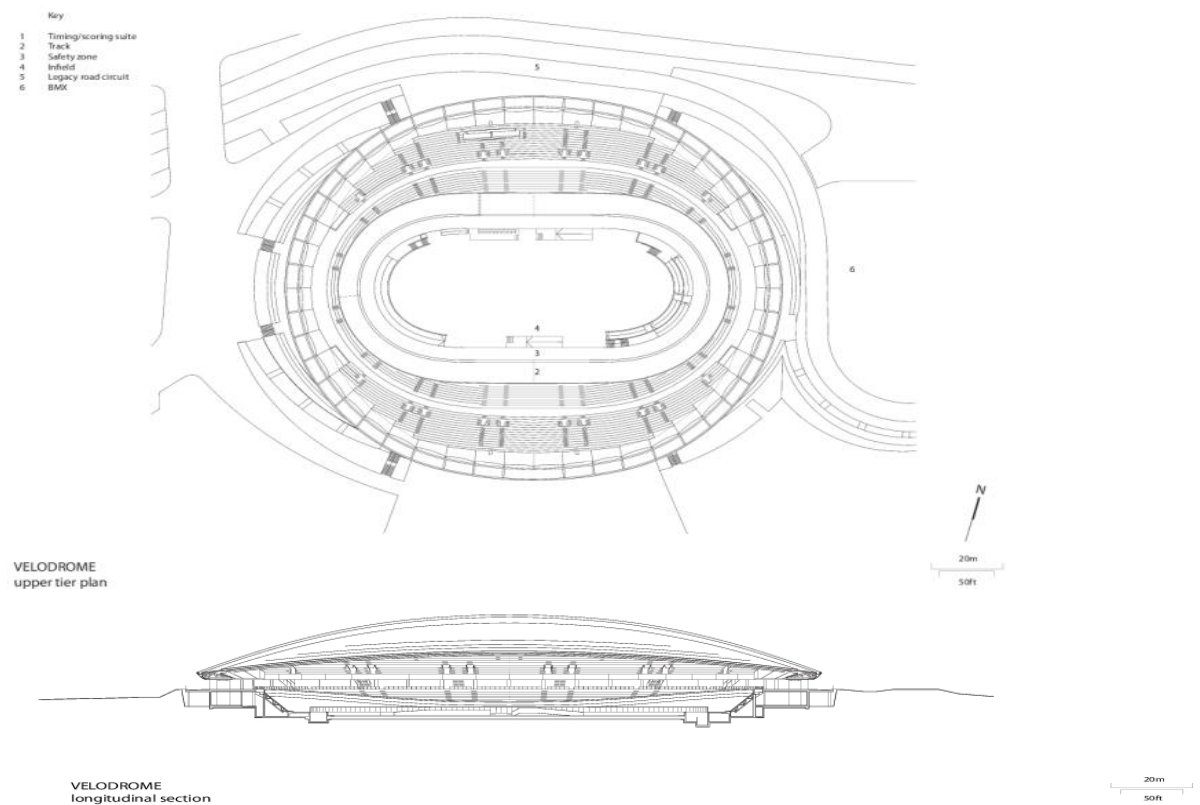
Upper-tier Plan and Sectional Elevation of Lee Valley Velopark
